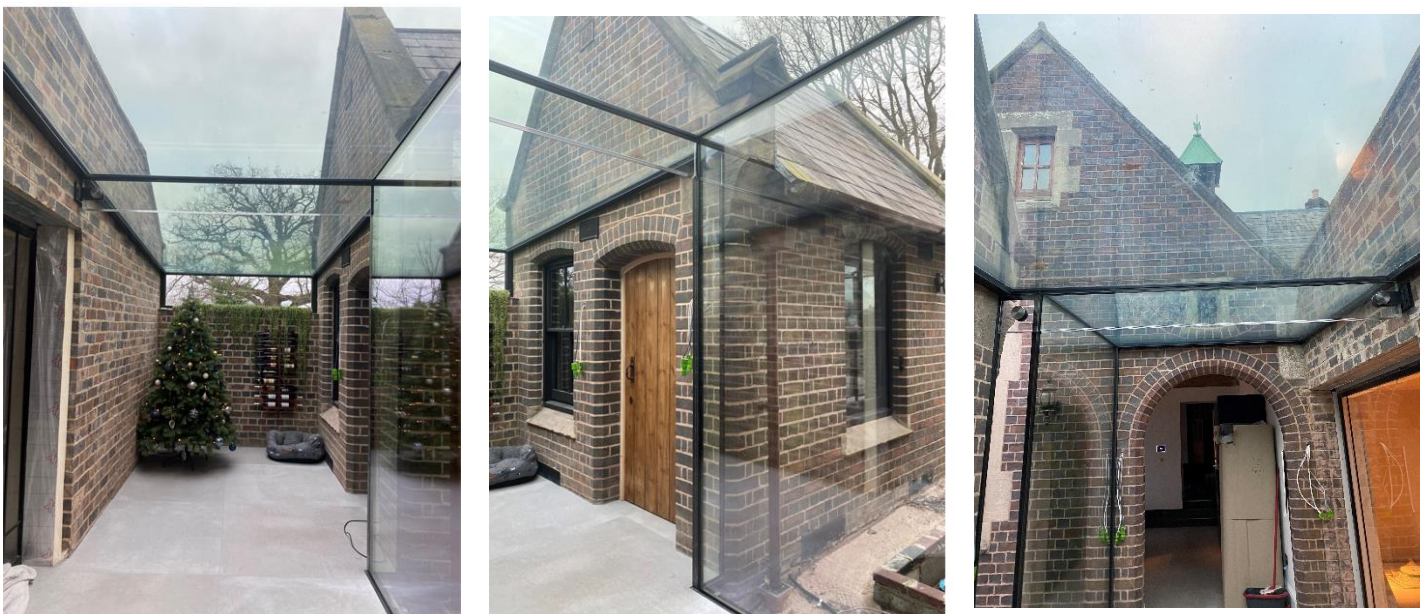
Photographs of glazed link facing boundary wall, Pheasant House and kitchen door
